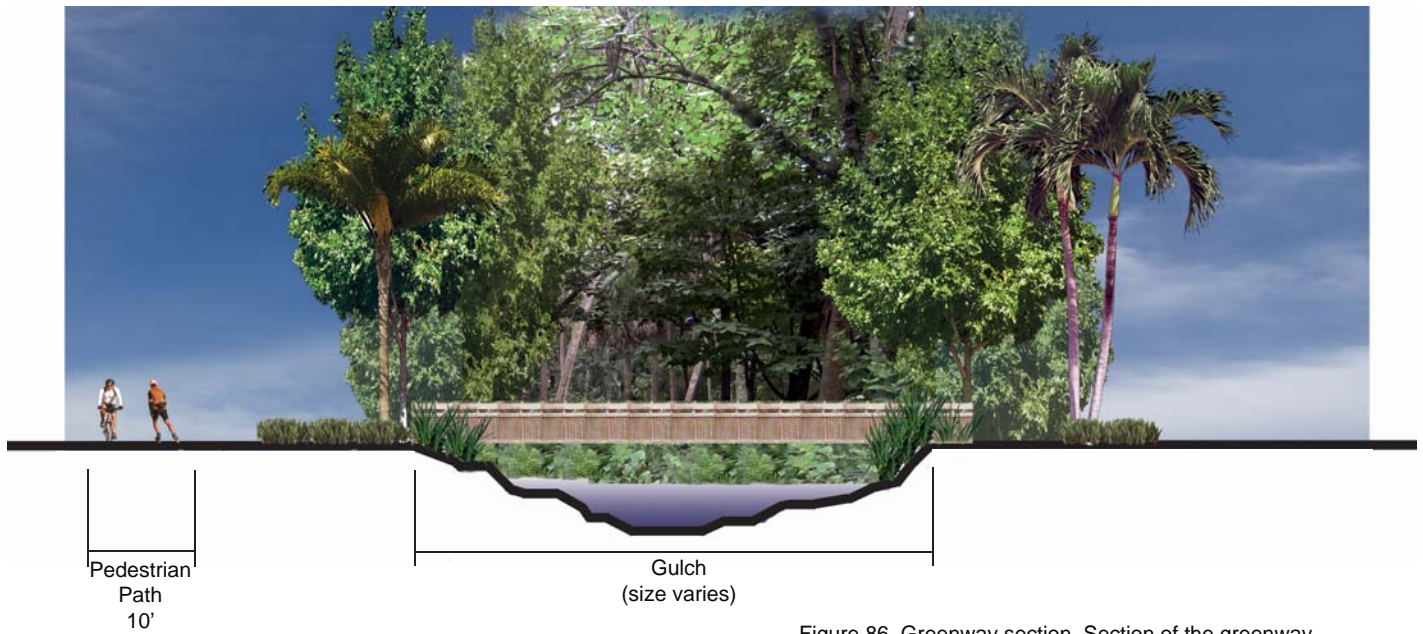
Greenway section. Section of the greenway looking north. Amy Shaffer.
